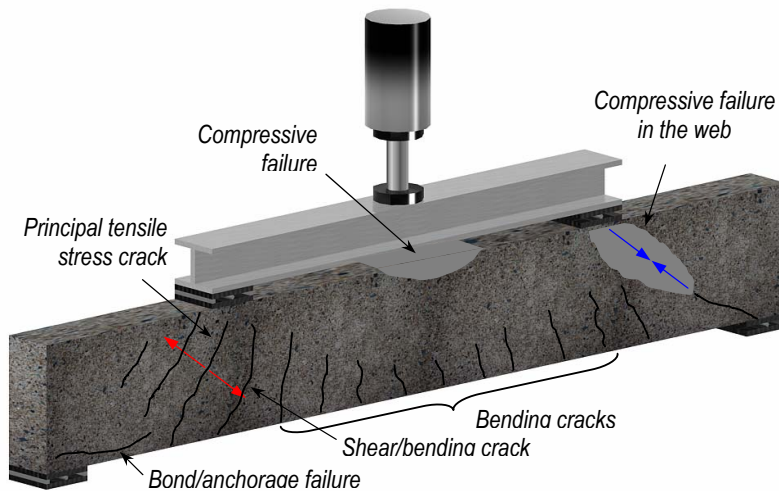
Shear failure modes in a beam (after Täljsten, 2006)
